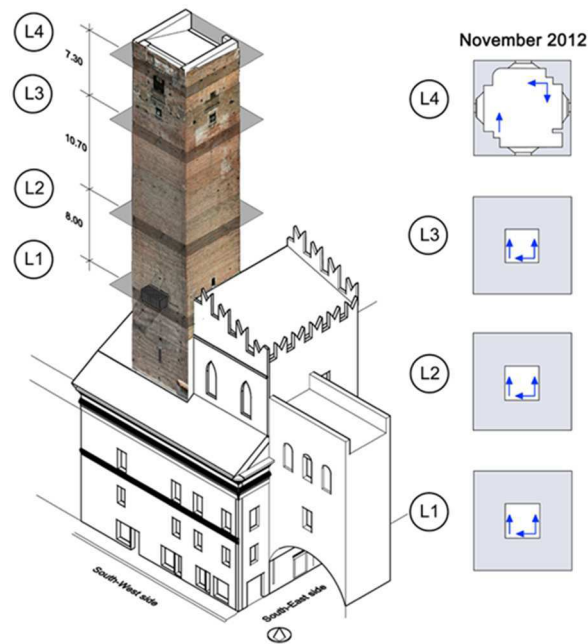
Instrumented cross-sections and sensors' layout adopted in the second AVT (27/11/2012)
